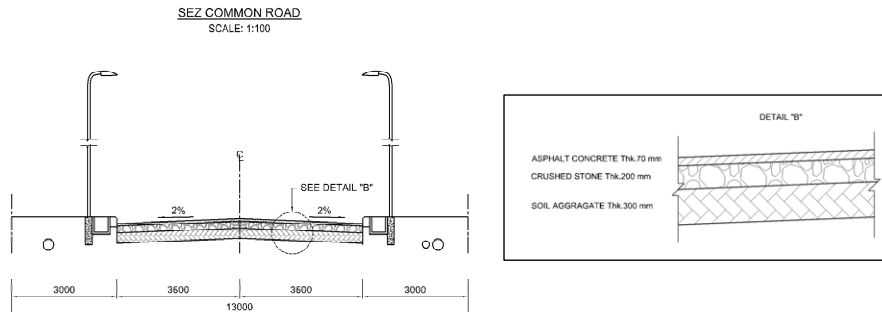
SEZ Access Road Typical Section and Pavement Composition
